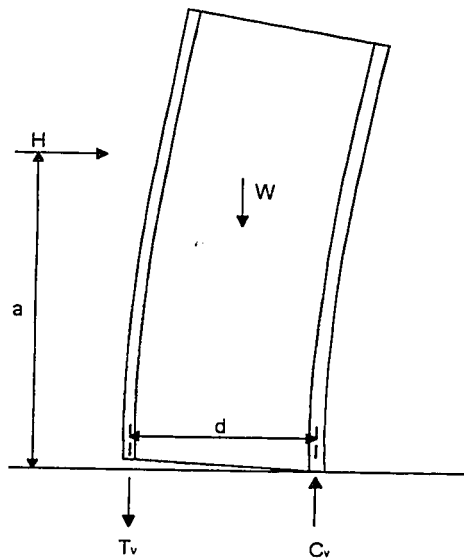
Loading condition assumed for design of boundary elements of shear walls
